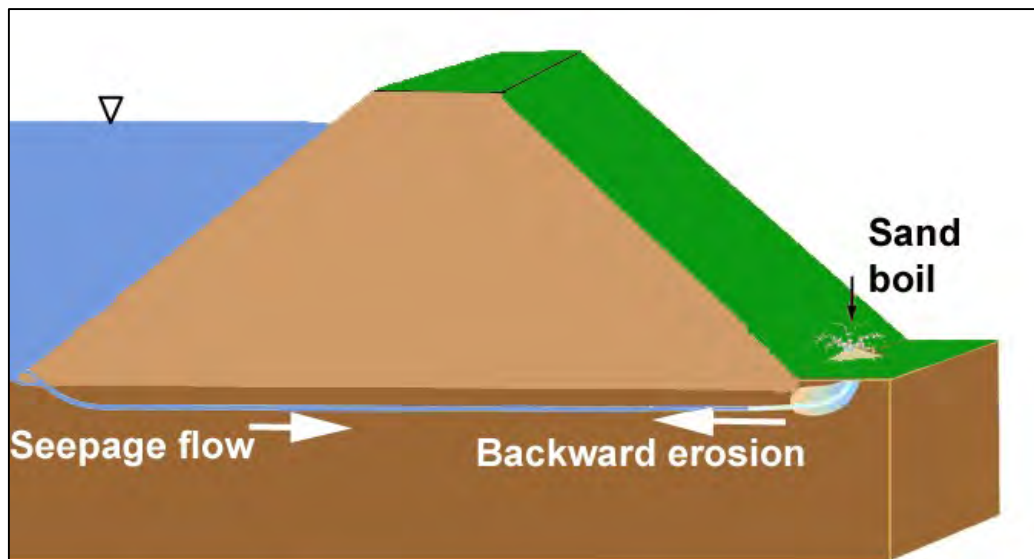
Illustration of sand boil formation near the downstream toe and potential backward erosion piping failure mode in the foundation.
